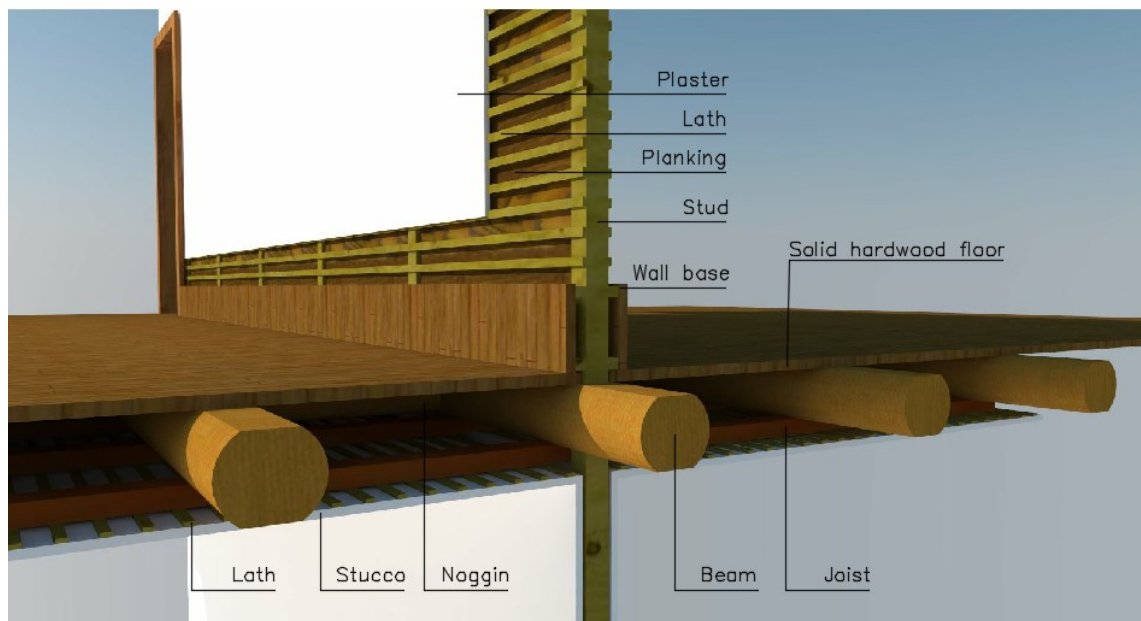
Schematic 3D drawing of traditional timber stud partition wall, floor and ceiling systems.
